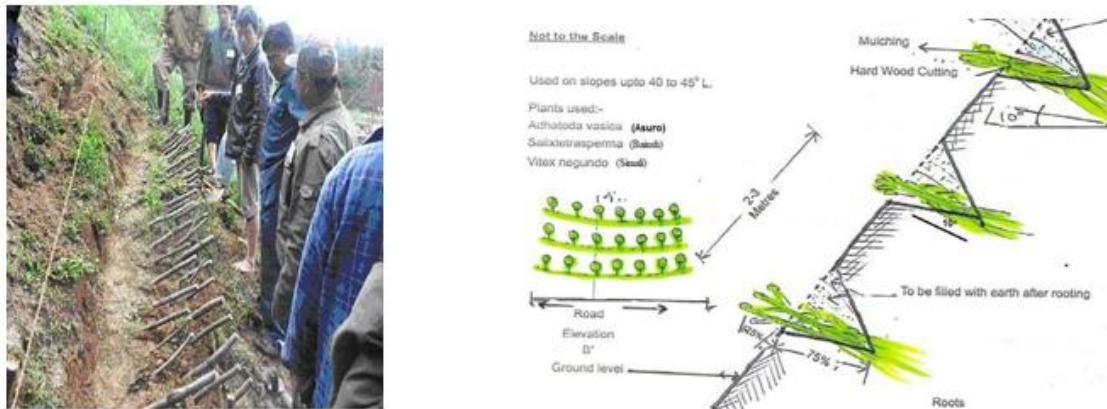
Brush Layering (Source: Road side Bio-engineering , Site Hand Book, John Howell)
